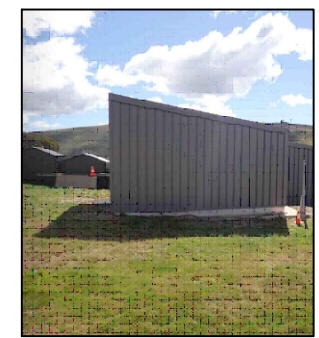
PHOTO TAKEN FROM SOUTH-EAST OF SITE
